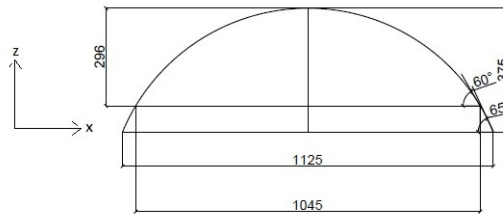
Section drawing of the spherical roof shape with dimensions [cm].
